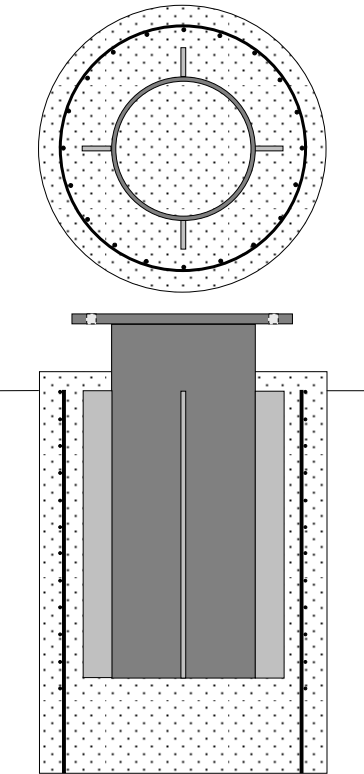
Alternate foundation: steel pipe with plates welded at four locations
